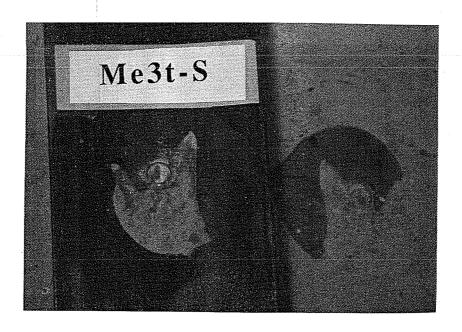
Epoxy bonded to both concrete and steel surfaces after failure - Test
